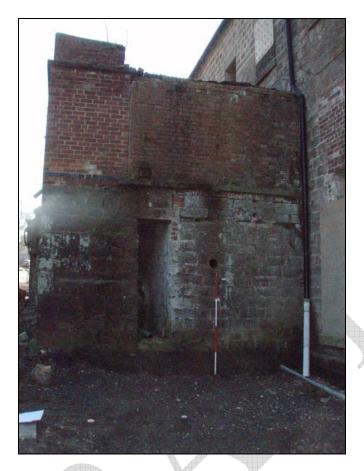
Photograph of the brick extension located on top of the boiler house (facing south-east) (scale = 2m).
